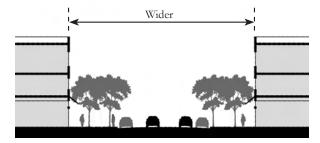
Buildings should not overwhelm the pedestrian experience on the street and should account for the relationship between building height and street width.
